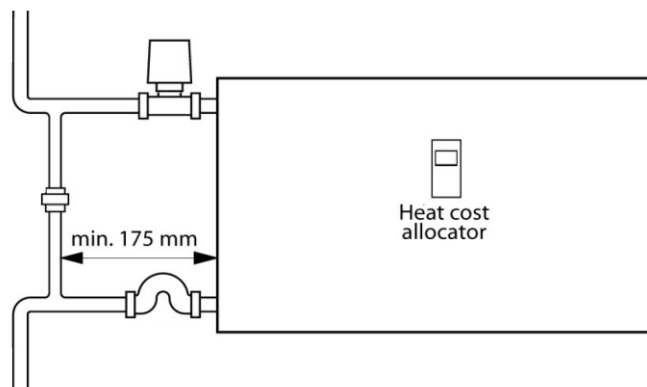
The reconstruction of one pipe heating system for multi-apartment buildings.
